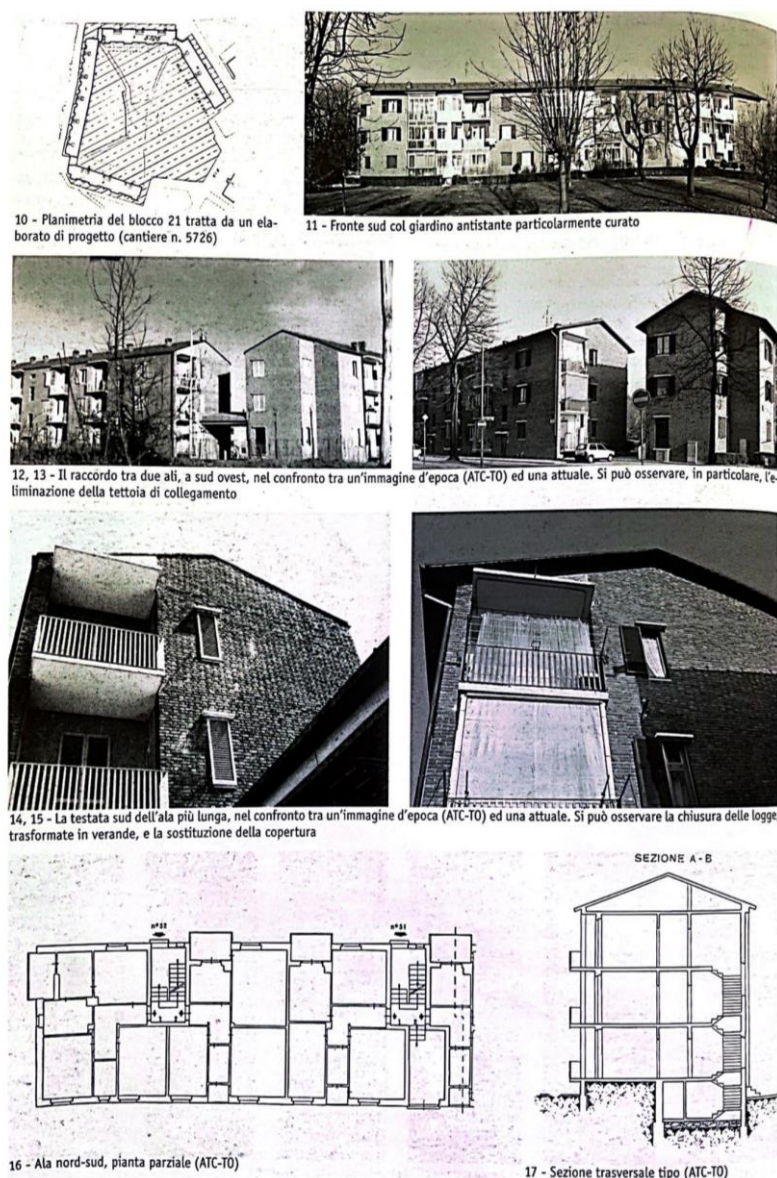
photo, plans and section of the block 21 in Felchera district (Source: p92 of *L'architettura INA Casa (1949-1963): aspetti e problemi di conservazione e recupero*)
